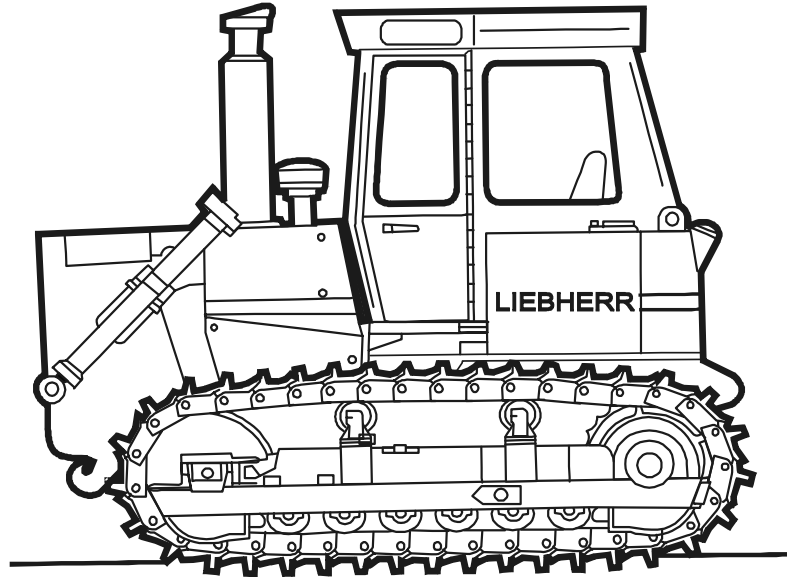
Crawler tractor (courtesy : Liebherr)
